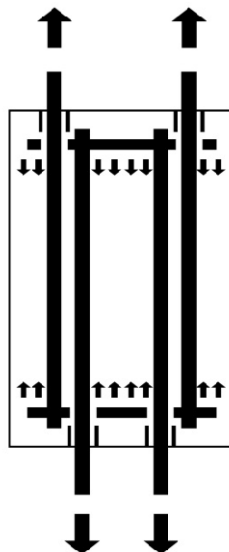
Compression force acting on concrete at the face of bearing plates.
